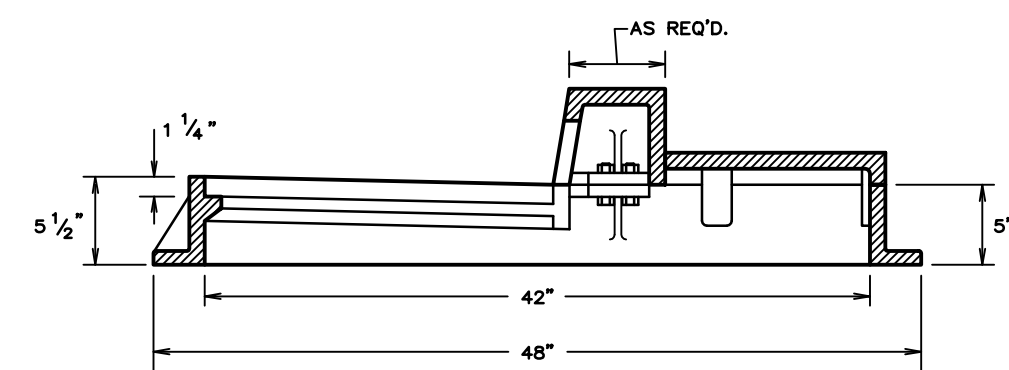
DETAIL: FRAME FOR INLET - TYPE 'D'
